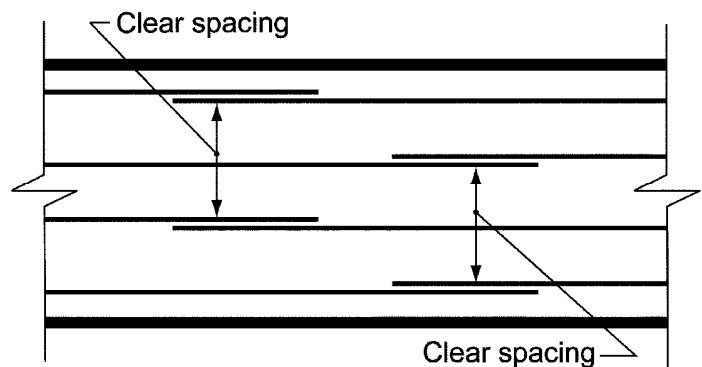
Clear spacing of lap-spliced bars for determination of ℓ_d for staggered splices.
